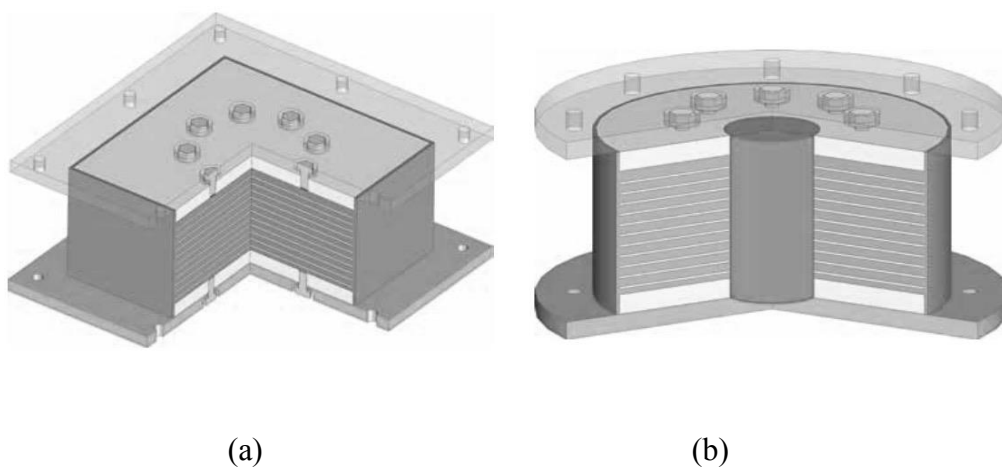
(a) Damped Rubber Bearing (b) Lead Rubber Bearing [38]
